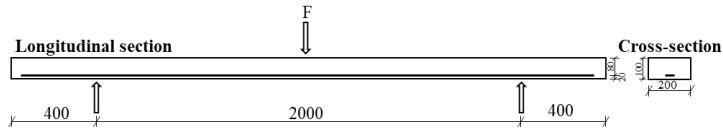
Shallow S-C1-9 beam test setup and dimensions (units in mm)
